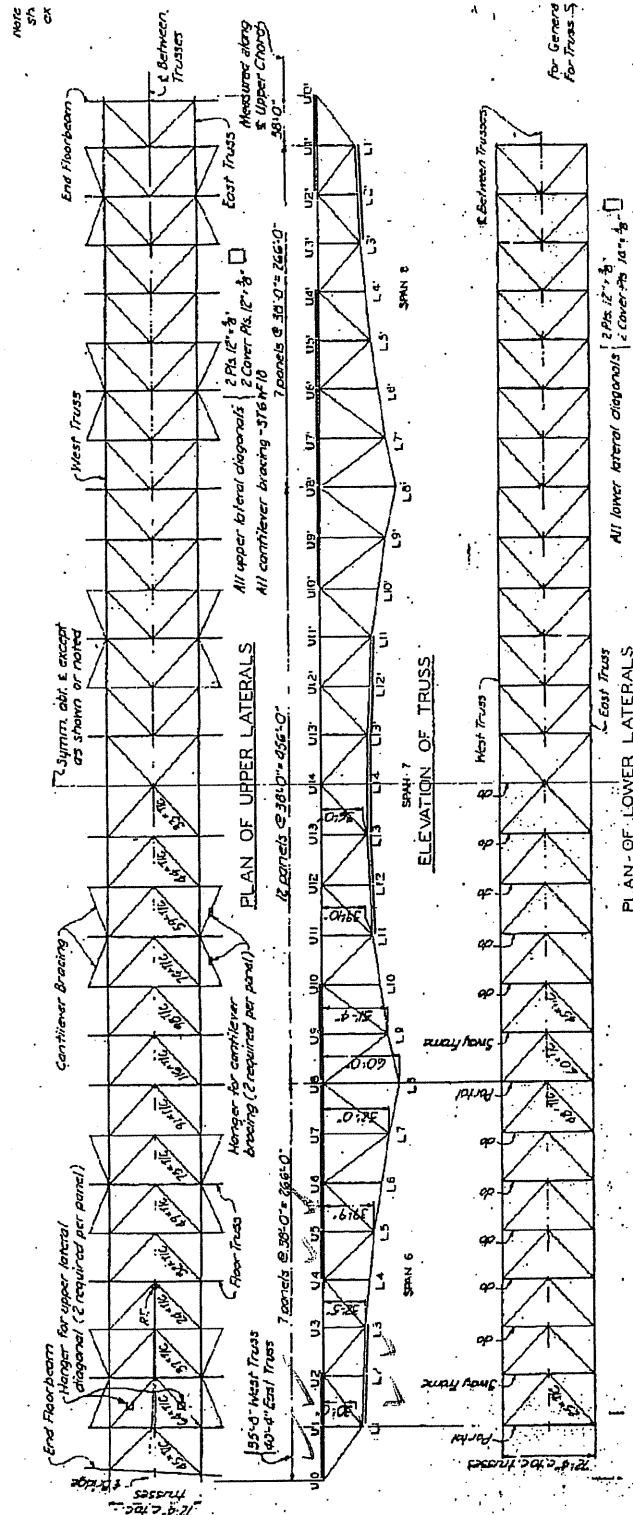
Deck Truss Framing Plan and Elevation from Original Contract Plans
